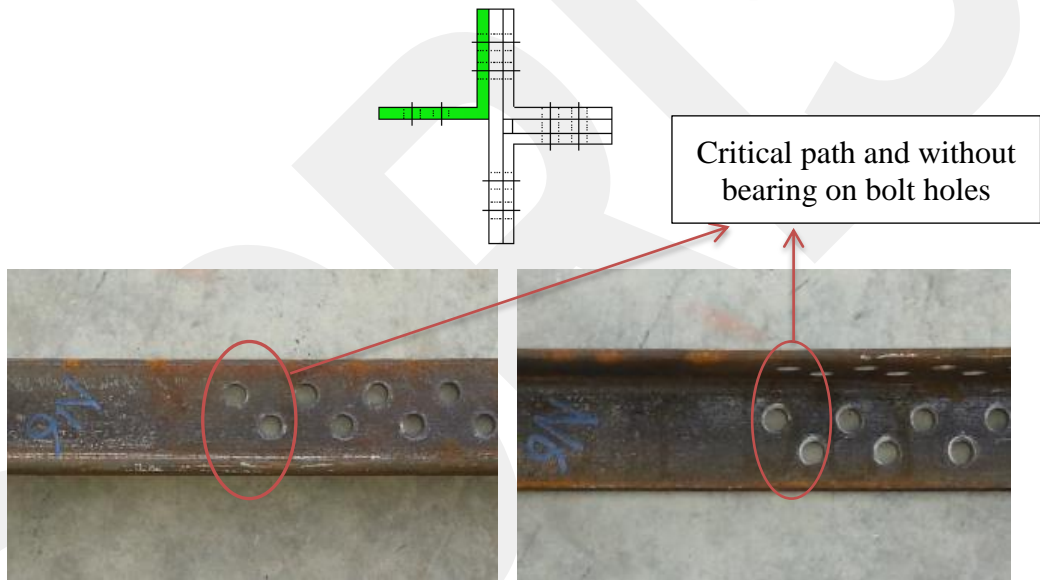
Bearing on lower main member 1 (Specimen-6)
